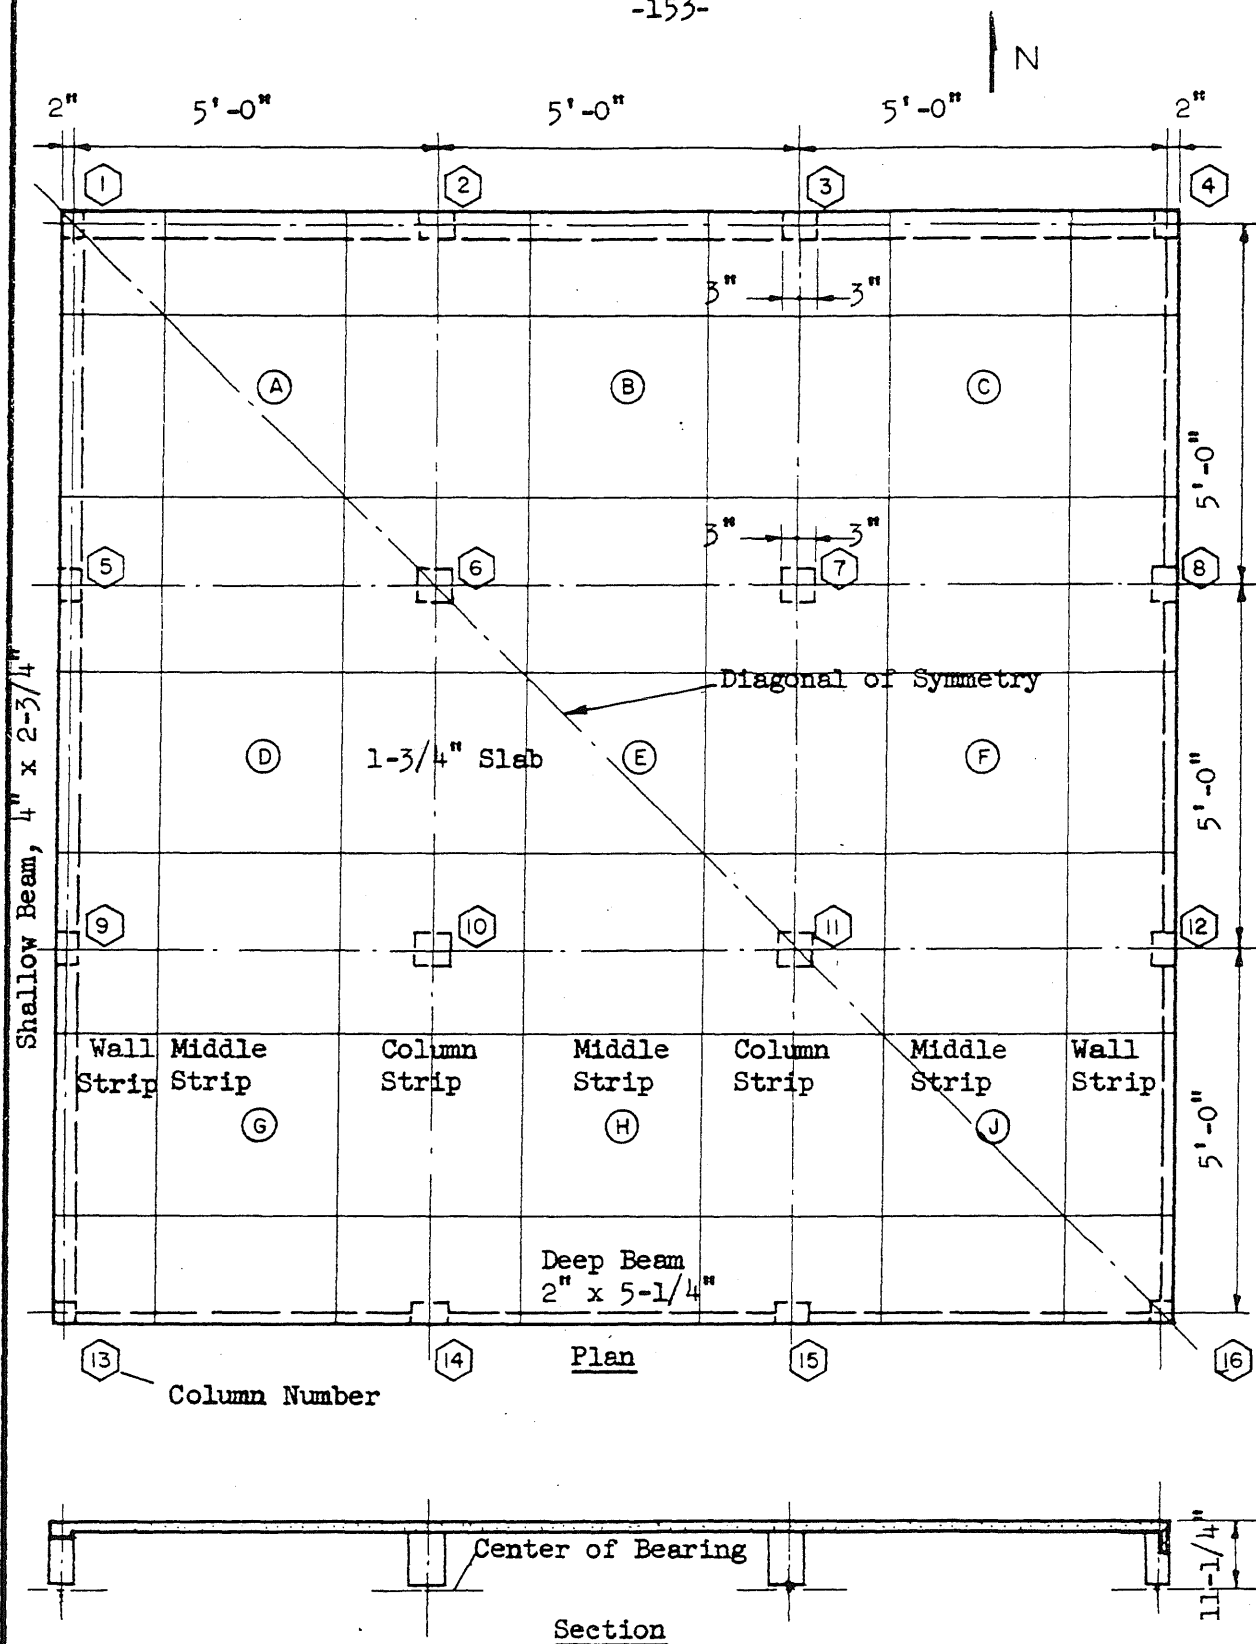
LAYOUT OF FLAT PLATE TEST STRUCTURE (F1)
